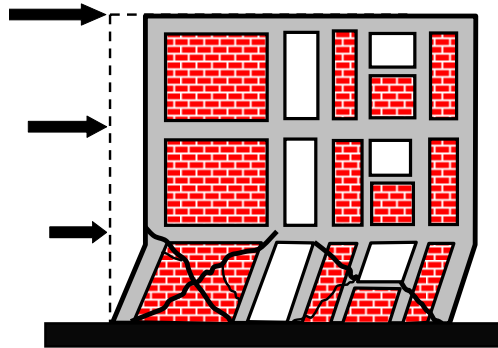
Soft-story collapse mechanism for multi-story confined masonry buildings (Alcocer et al., 2004).
